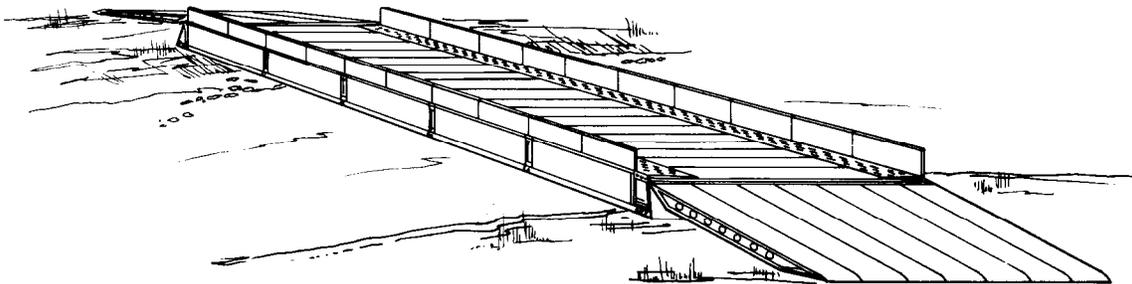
Five-bay, single-story, medium girder (fixed) bridge assembled
